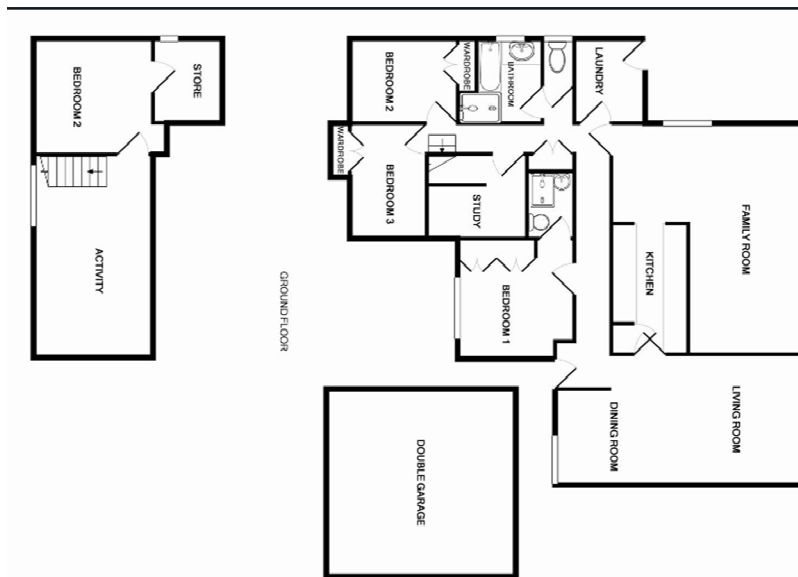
Floor Plans for No. 13 Chetwynd Way with portion abutting subject development site to the top of the image (Source: REIWA)
